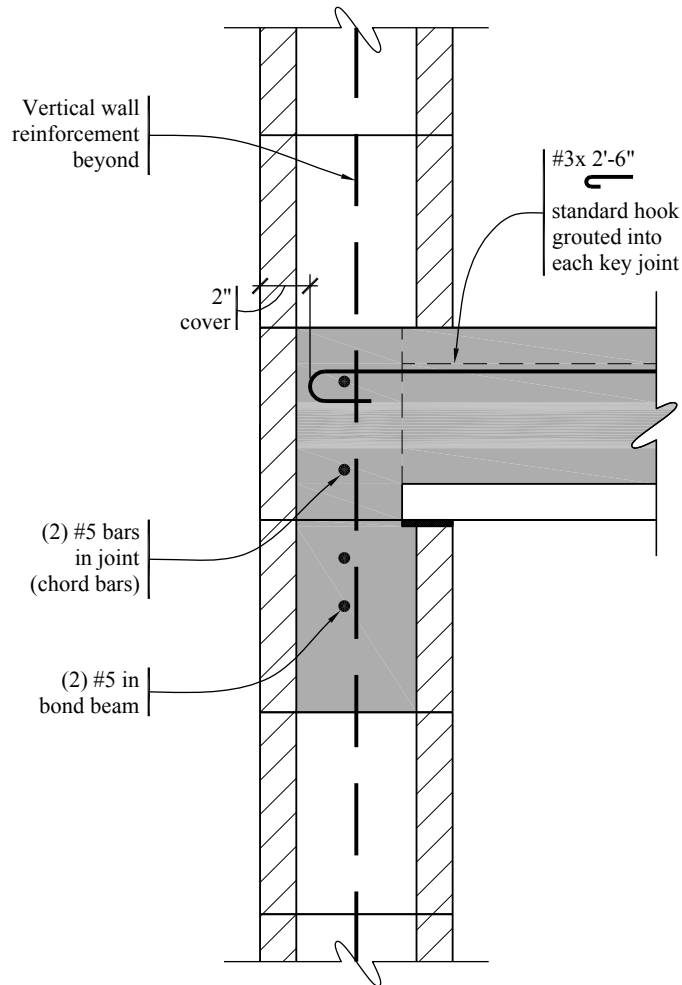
Joint 4 exterior longitudinal walls to diaphragm reinforcement and out-of-plane anchorage
